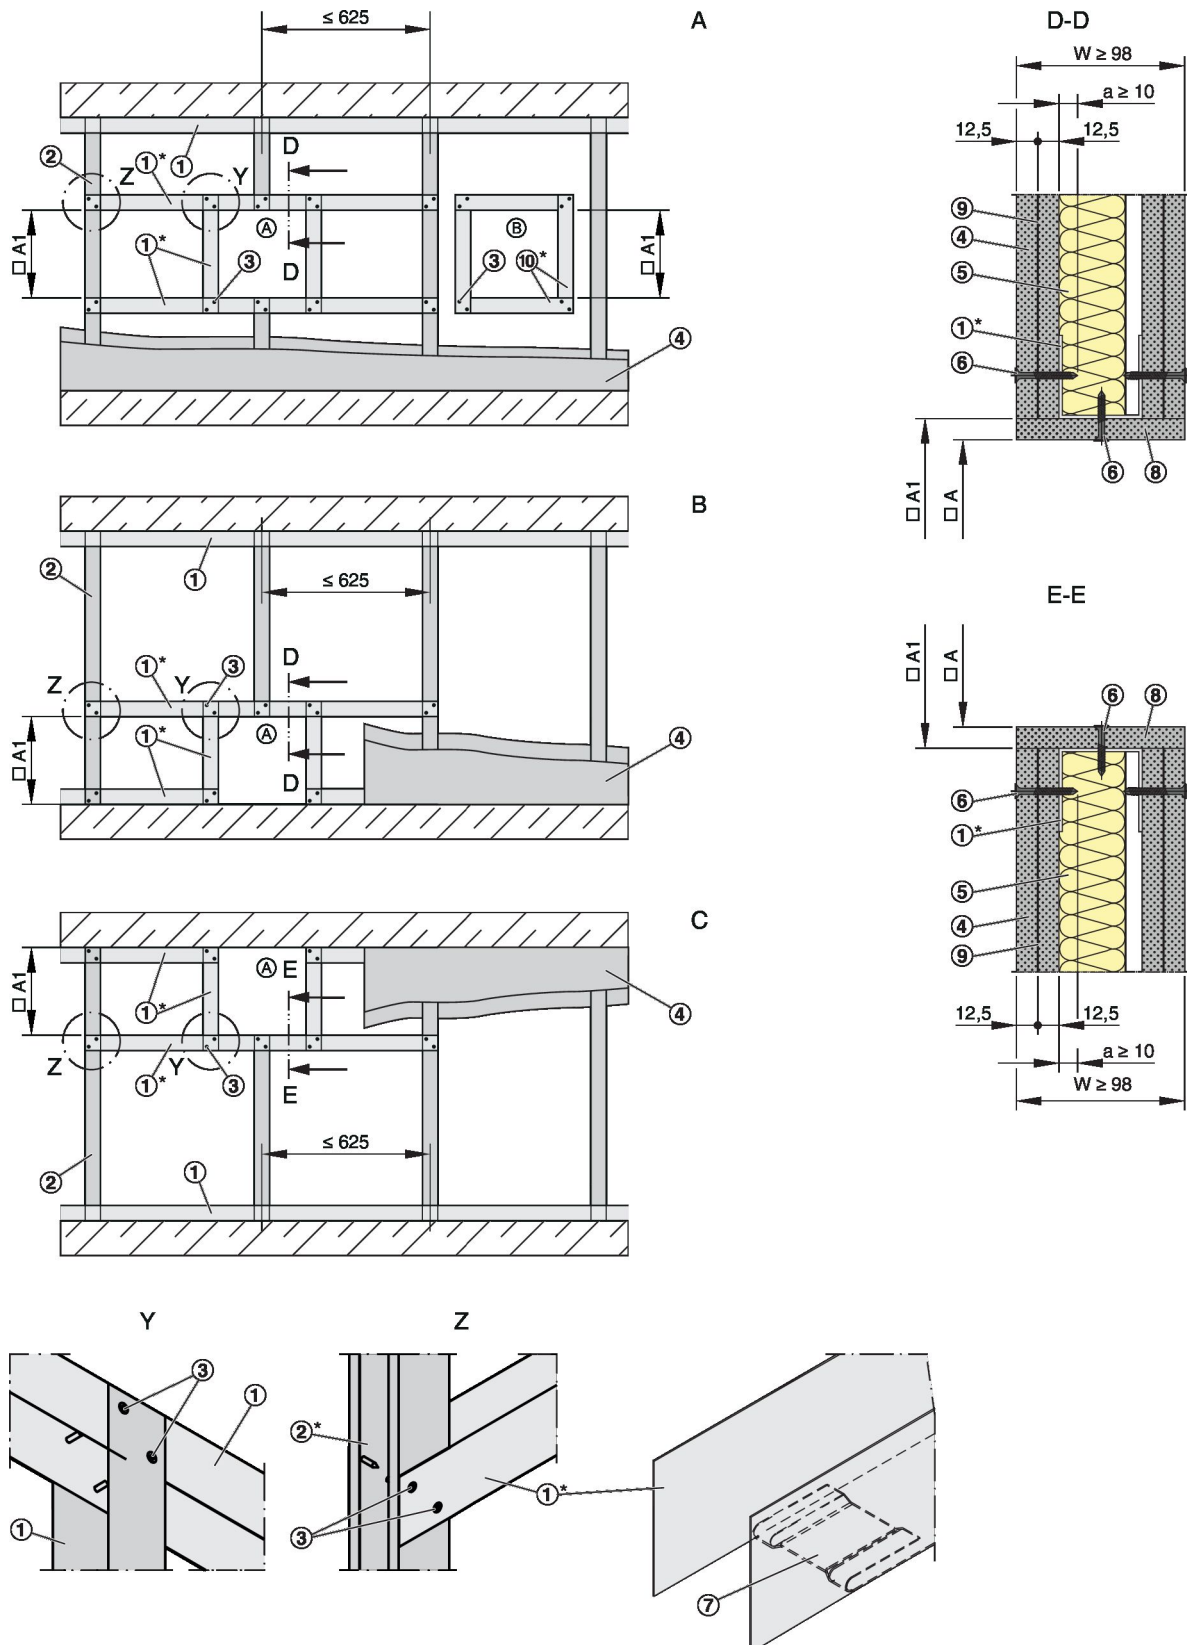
Lightweight partition wall with metal support structure and cladding on both sides
